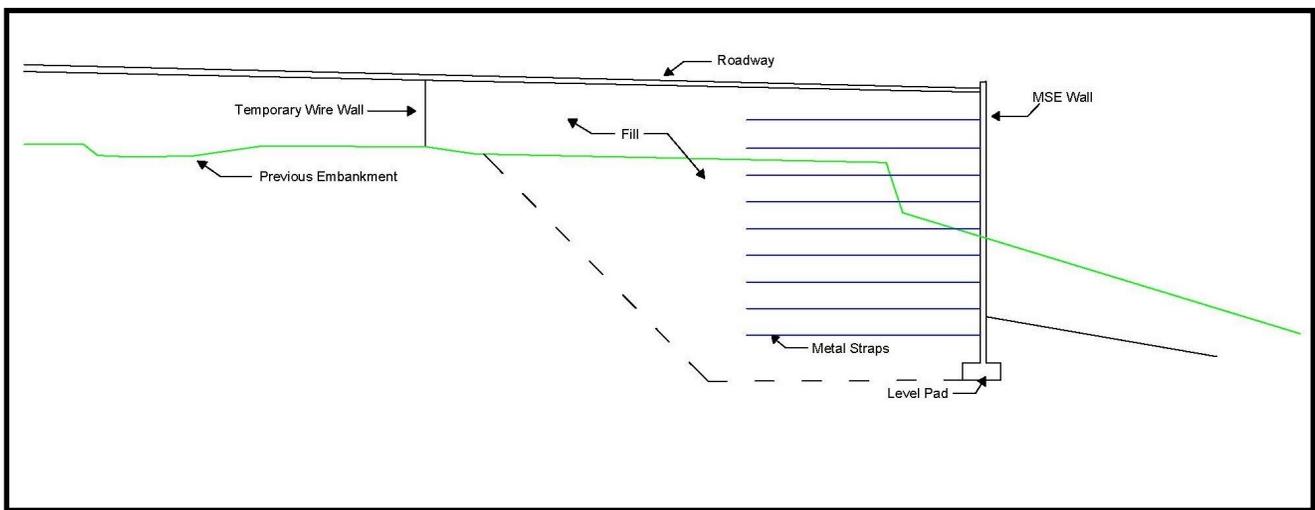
TYPICAL CROSS-SECTION OF CONSTRUCTION OF INTERSTATE WIDENING
